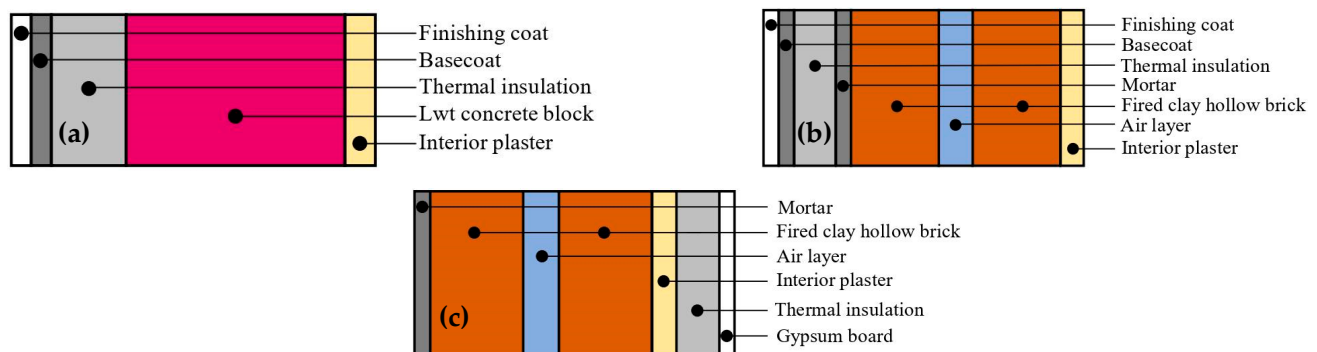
Section view of the studied wall assemblies: (a) new construction (NW and ZNW); (b) outdoor retrofit (RE); (c) indoor retrofit (RI).
